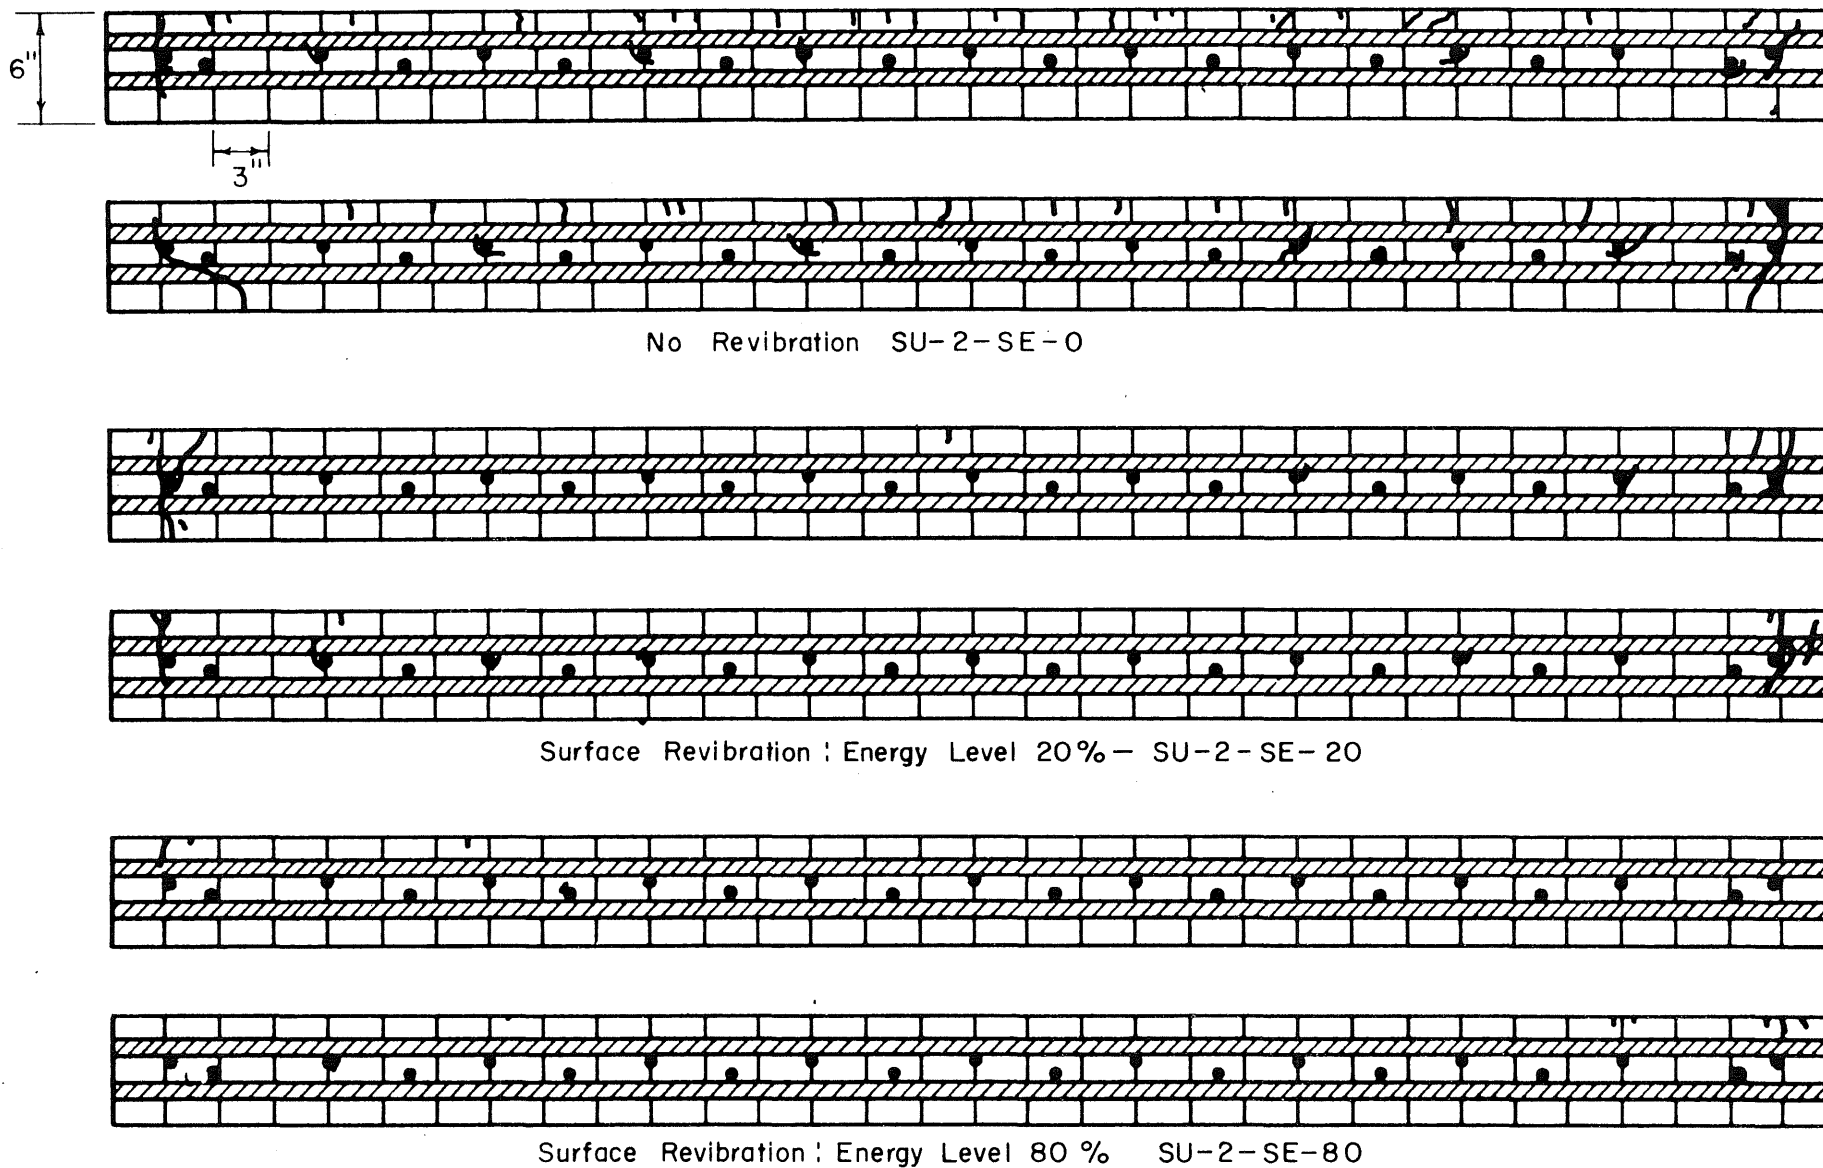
SECTIONS OF SEVERELY CRACKED CONCRETE SLABS - SURFACE REVIBRATION
